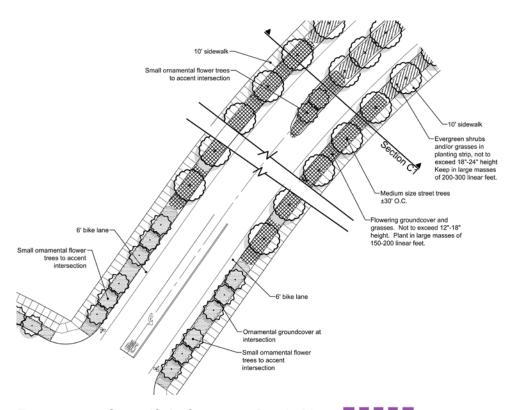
Street 'C1' - Connector Road - Plan
